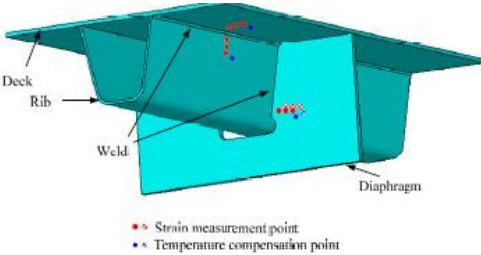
Measurement points of FBG sensors for measuring strains near welds, [23]
